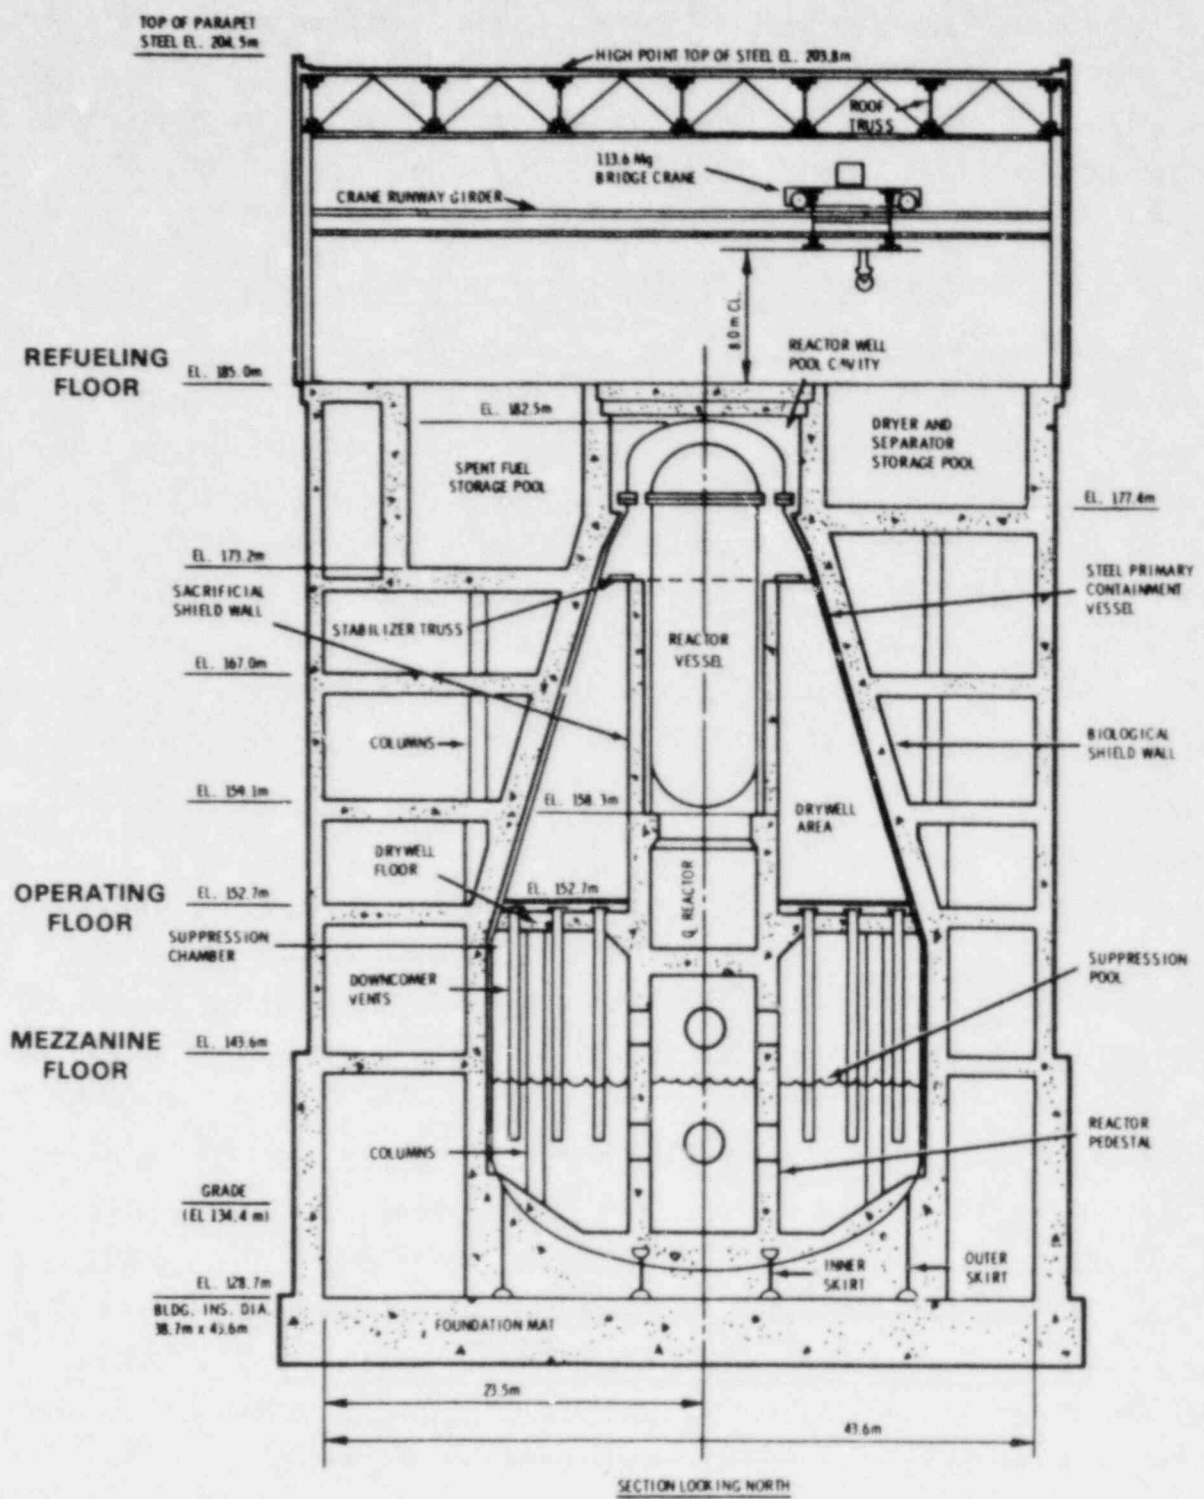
Vertical Section of BWR Reactor Building
